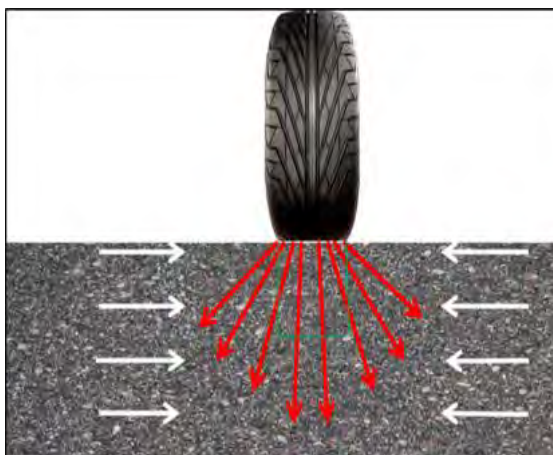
Pavement in the field surrounded by lateral asphalt
